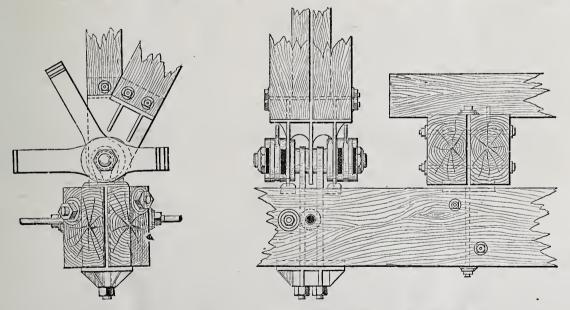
Details of Lower Chord and Floor Beam at Second Compression Brace.
